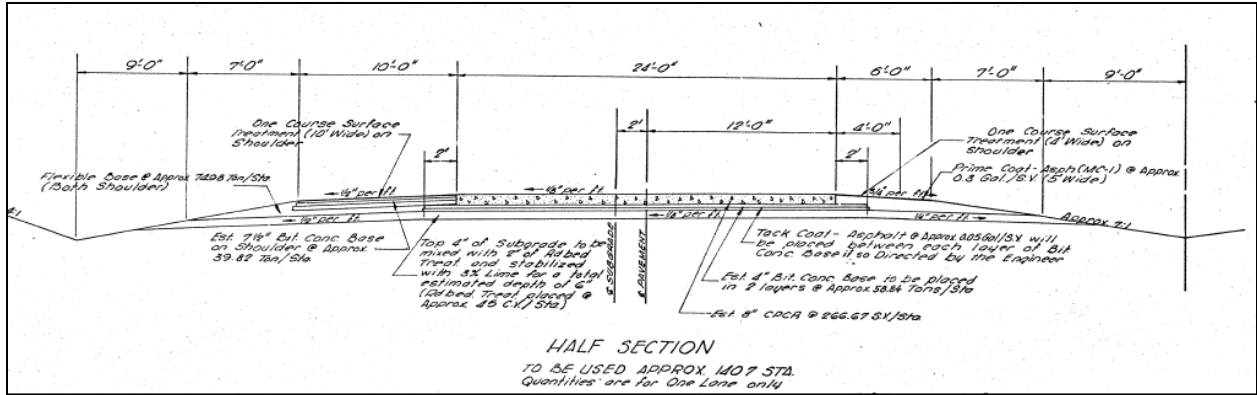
1962 Mainlane Half Section from North of SH 75 to FM 1696.
